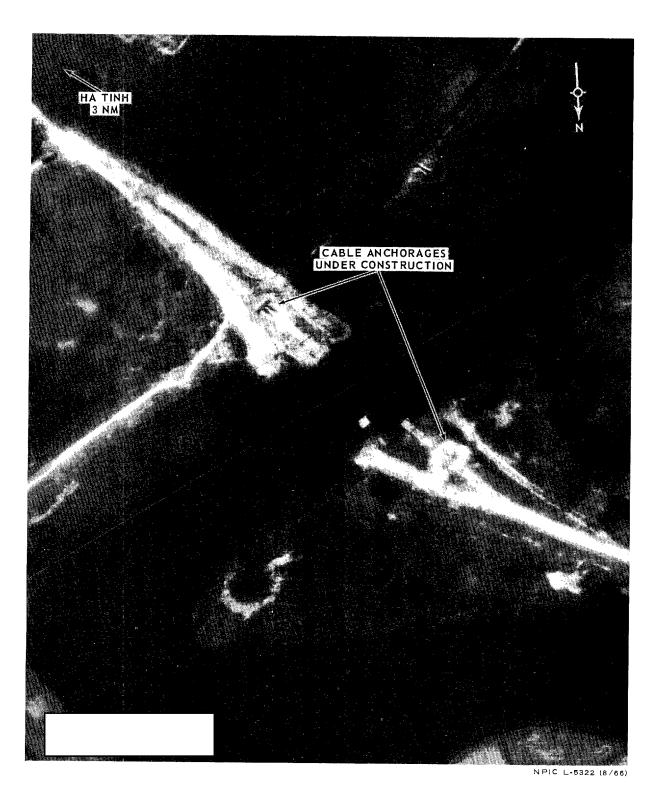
VEHICULAR CABLE BRIDGE UNDER CONSTRUCTION, ROUTE 1A, NORTH VIETNAM
